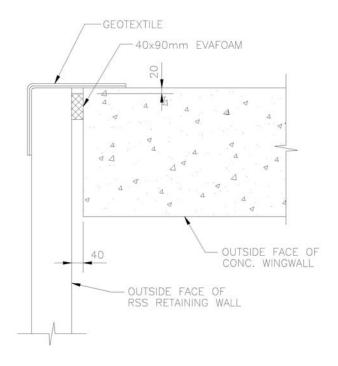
RSS Angled Joint at Wingwall (Plan View).
